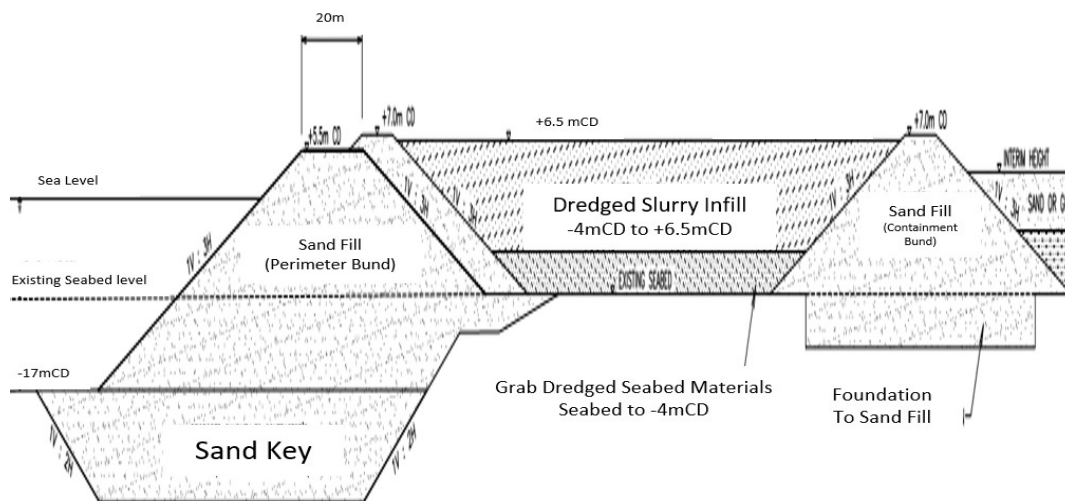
Cross section of contract stipulated stage 02 bund construction and dredged material deposition plan
